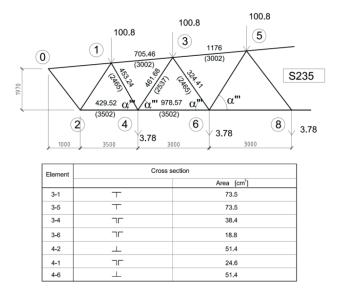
Roof truss beam - elements cross sections, loads and stresses
